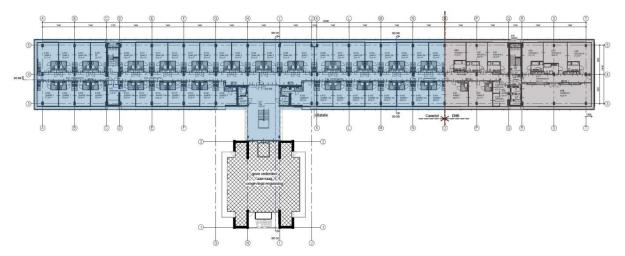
Floor plan of 1st-9th floors including division into the student housing (Camelot) and the hotel (DHK)
